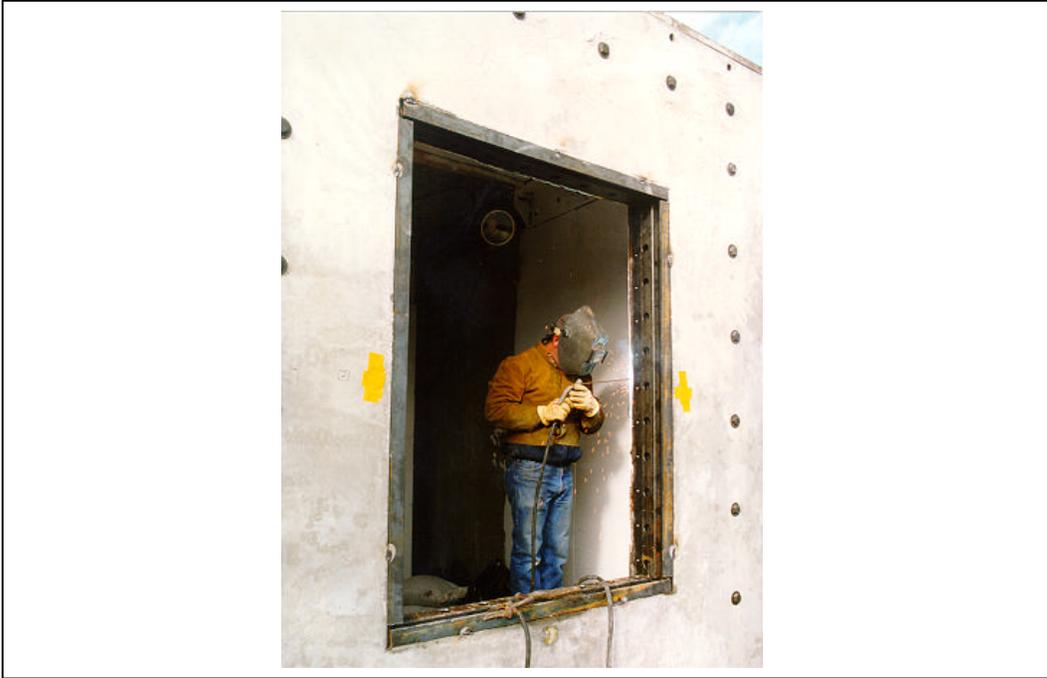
View of a technician welding the window frame to the embed (3M PREP 12.tif).
